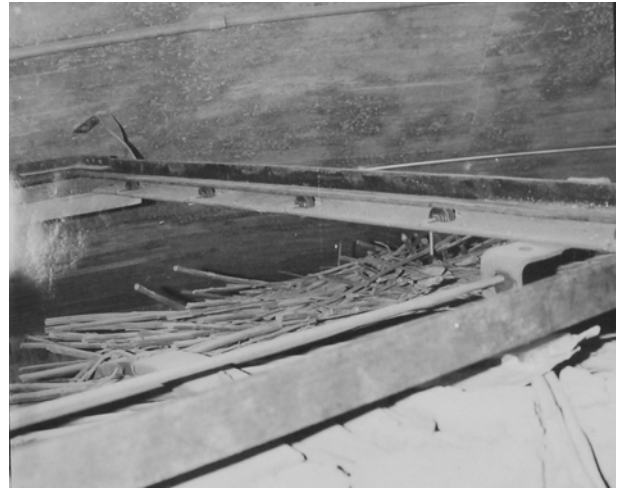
View of inside of concrete shell above lodge ceiling, 1974, showing part of original track installed for retracting skylight in 1937. (OCMU Coll.)
